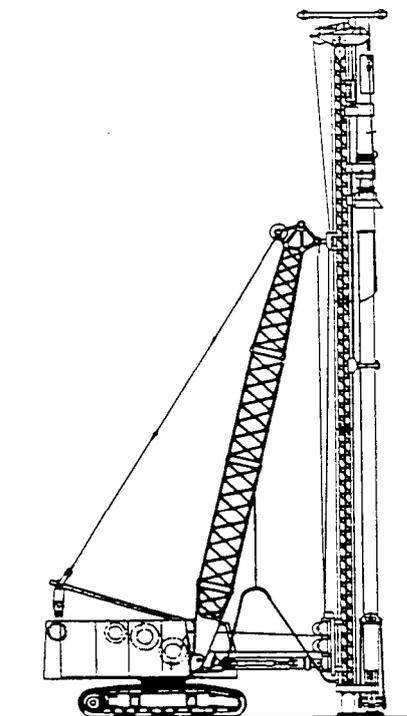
Crawler type cable excavator with piling equipment (hydraulic or diesel hammer)
